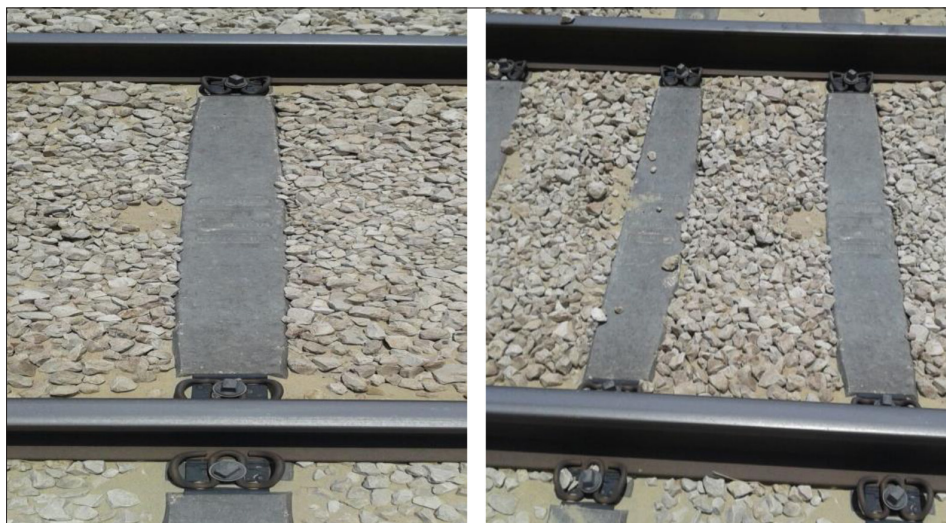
New Installed concrete sleepers (see table 6 mix design)
